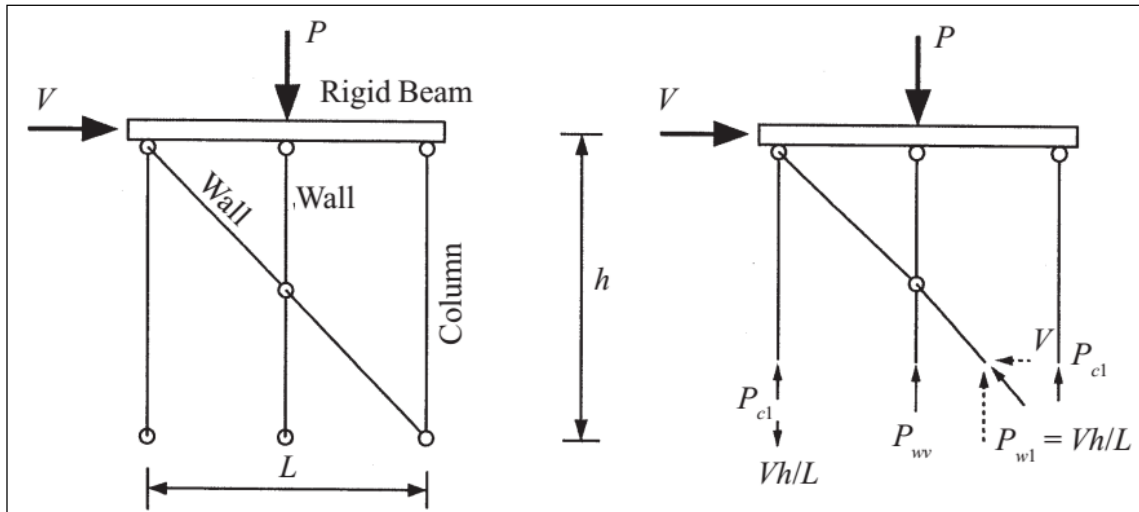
Vertical load distribution model (Mehrabı & Shing, Seismic Analysis of Masonry-Infilled Reinforced Concrete Frames, 2003)
